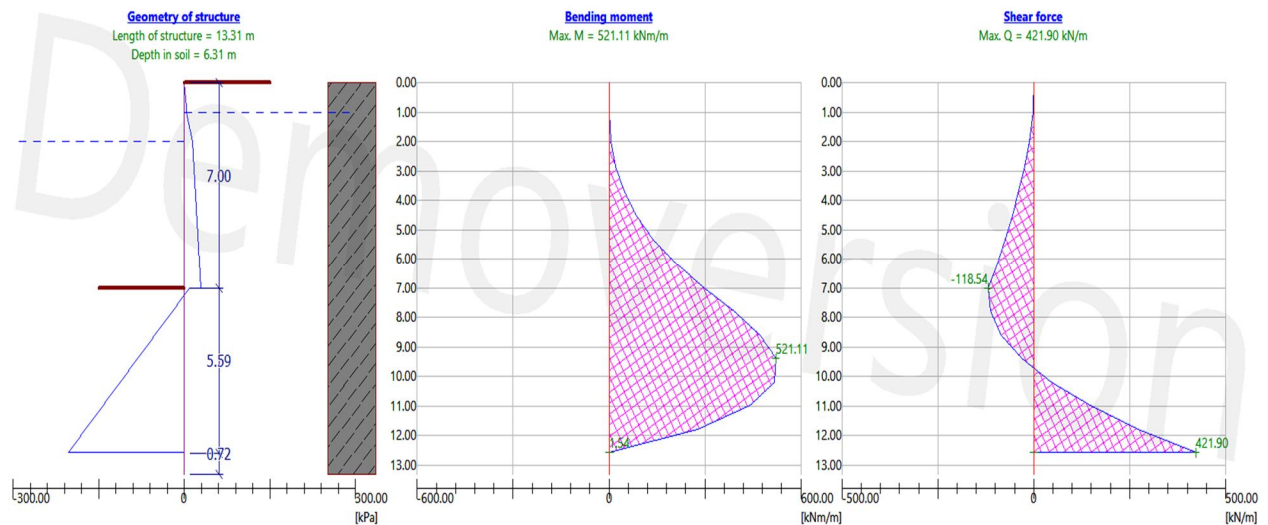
Model 3: U-section sheet pile wall for 7m depth of ditch in 1 layer soil
